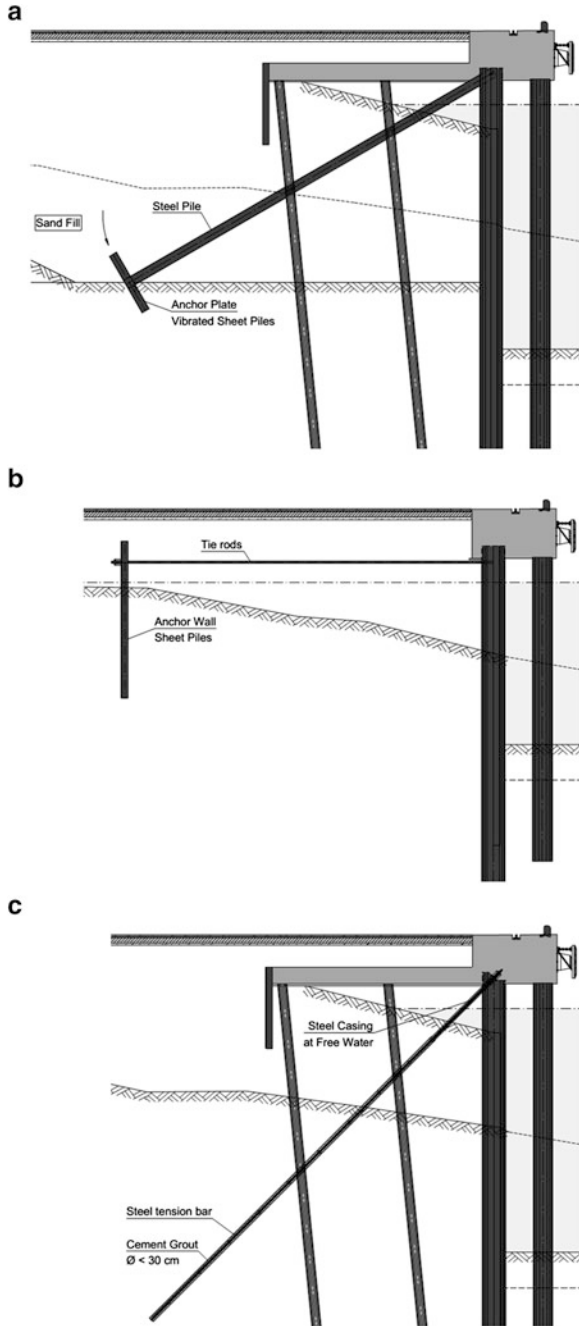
Anchored sheet pile wall with shielding slab, slope and fender piles (cross section)
